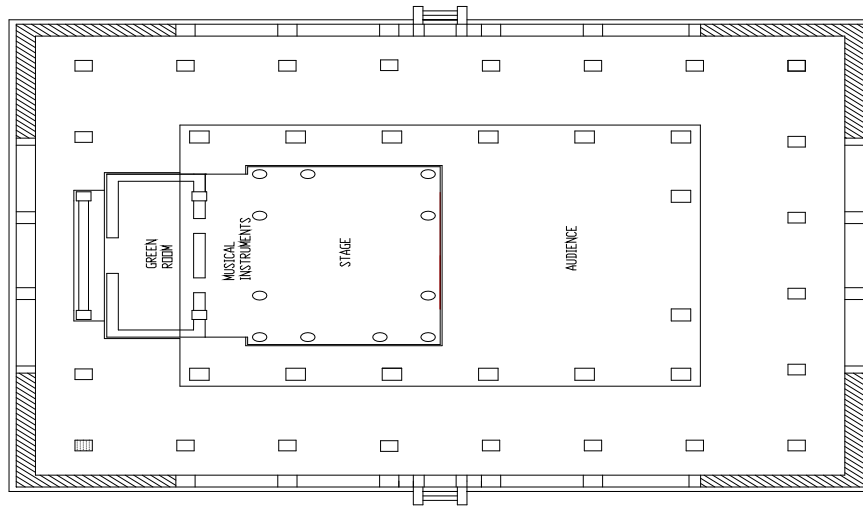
TYPICAL LAYOUT OF KUTTAMPALAM
